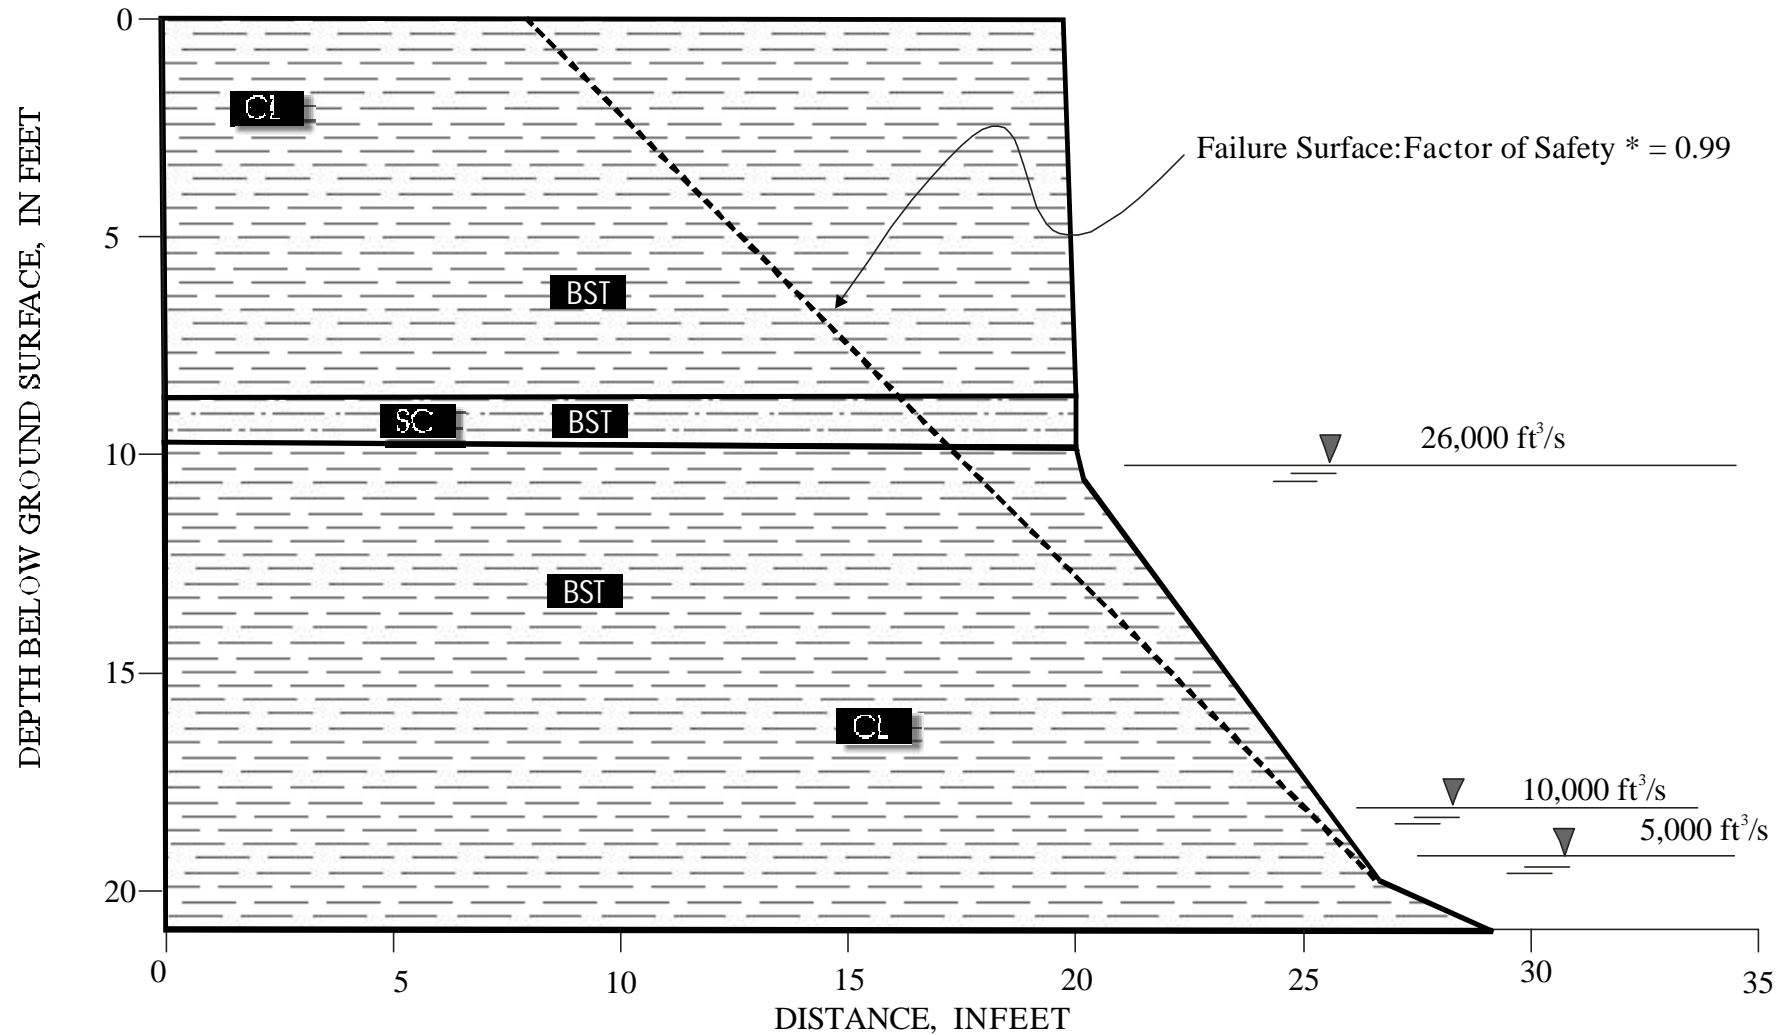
Idealized bank section at river mile 1701 (Wolf Point) showing the modeled, planar critical failure-surface, factor of safety (F_s), river stage and groundwater levels, location of BST tests, and differentiated soil units.
